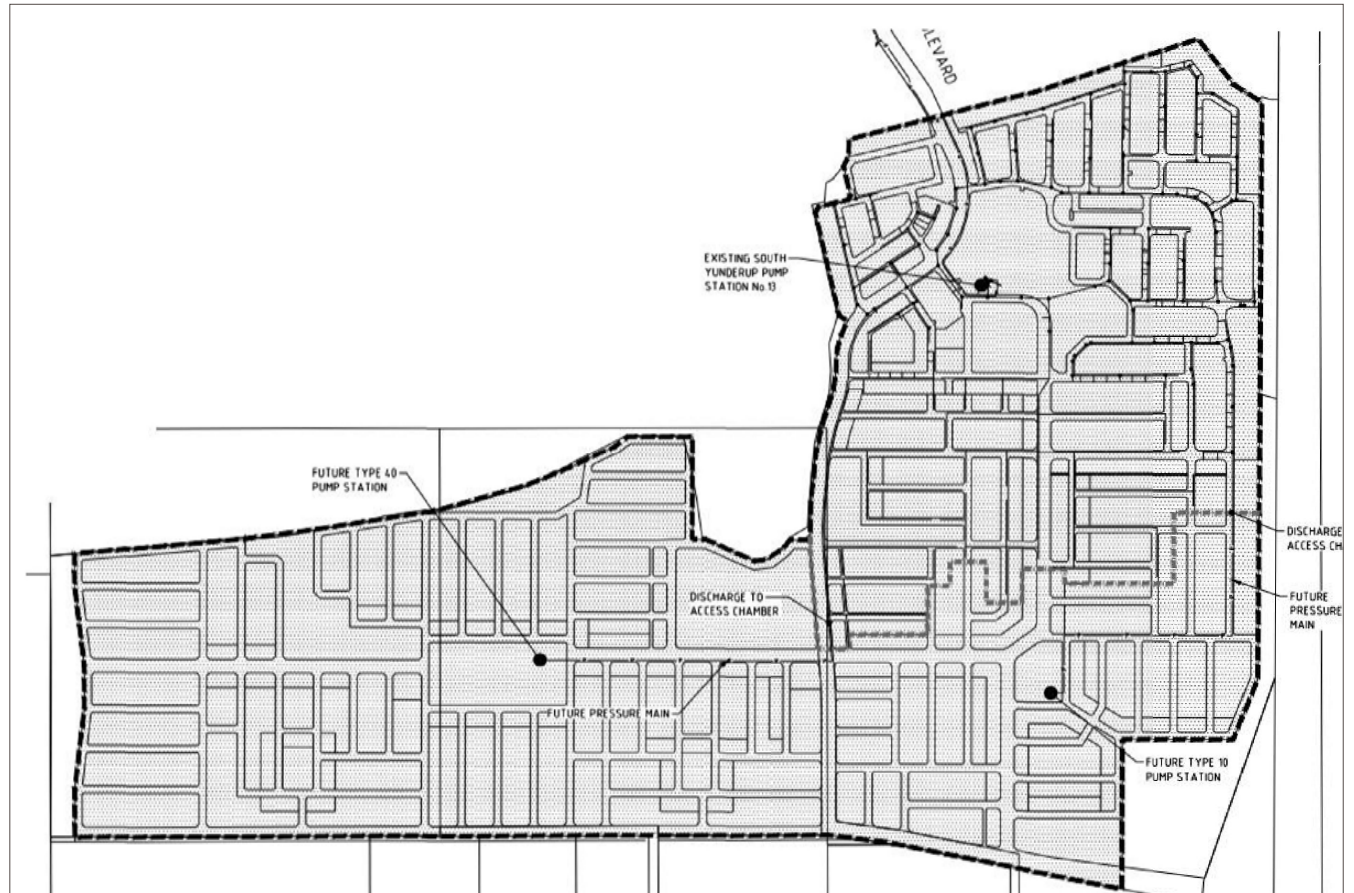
Sewer Reticulation Plan (Source: Cossill & Webley)
